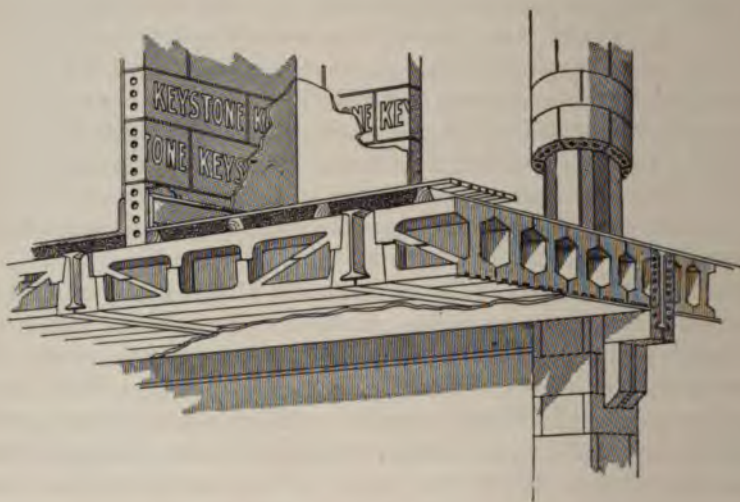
KEYSTONE FIRE-PROOF CONSTRUCTION.
